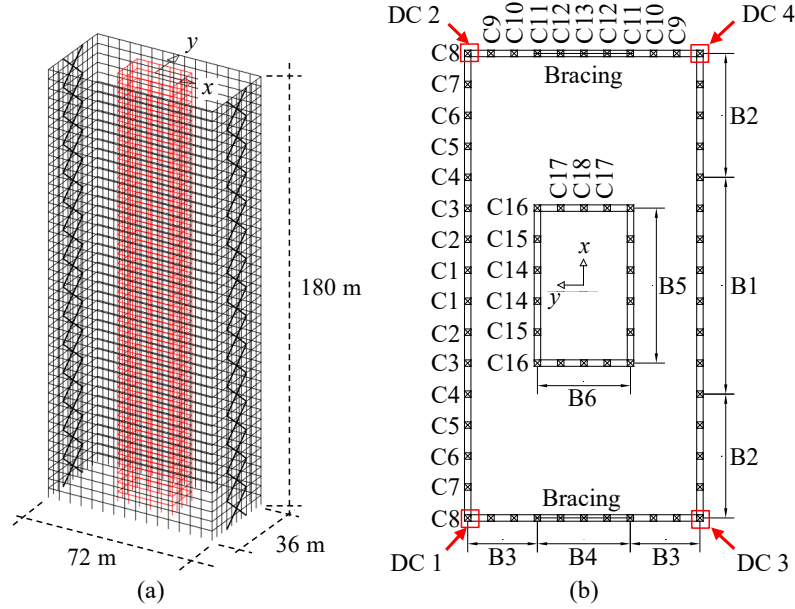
(a) 3D view of the 45-story building and (b) typical floor layout with the four design columns (DC) highlighted.
